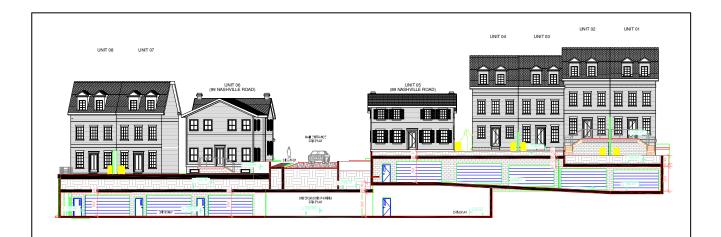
Site Section looking north, taken just behind the Nashville Road houses, showing below-grade parking. The rear additions on the heritage houses are visible here, flanking the driveway entrance.
